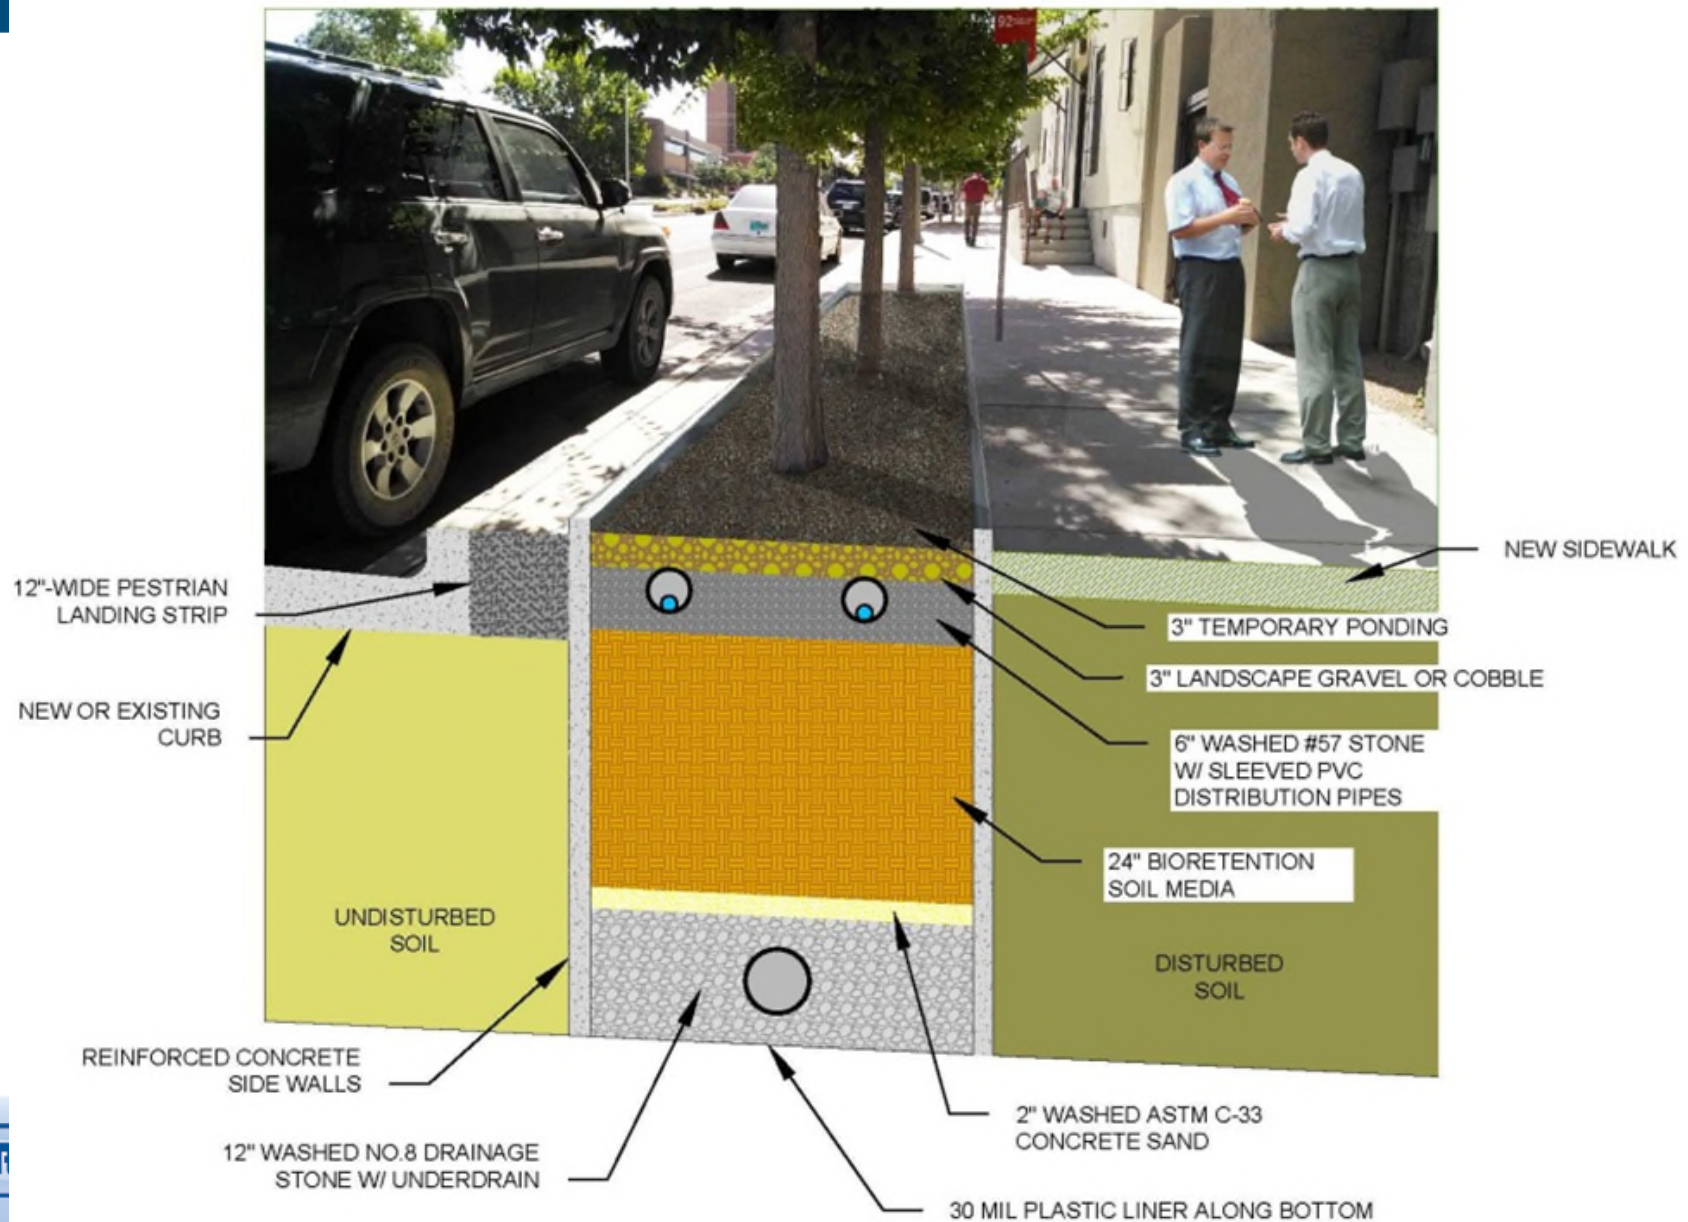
SILVER AVE. PLANTER BOX PLAN
